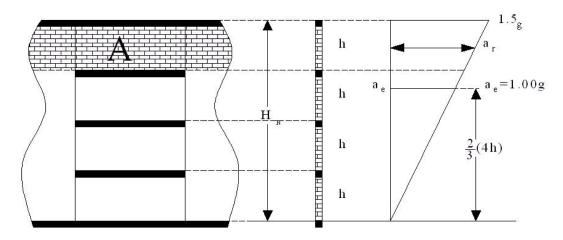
Maximum out-of-plane acceleration acting on the wall at roof level of a 4-storey building.
